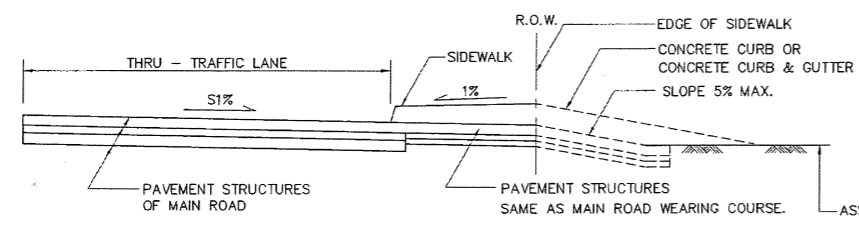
TYPICAL PUBLIC SIDE ROAD AT SIDEWALK (PROFILE)
